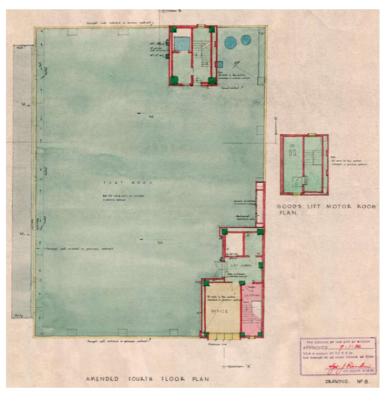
Original Fourth Floor (Roof) plan, dated 1956, after construction was complete.
